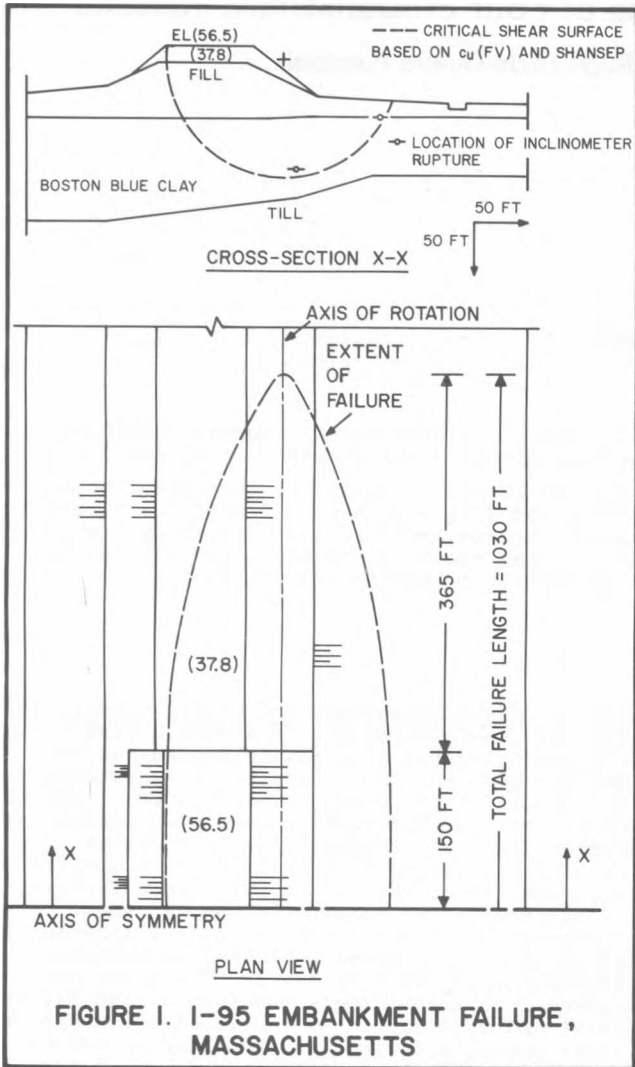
I-95 EMBANKMENT FAILURE, MASSACHUSETTS
